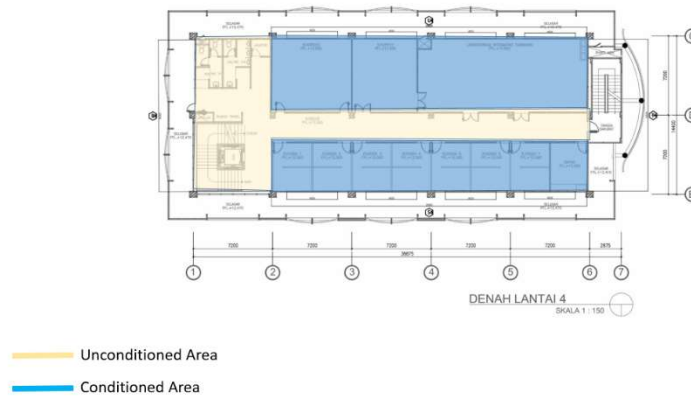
Floor Plan 4 Building B Faculty of Biology UGM.
